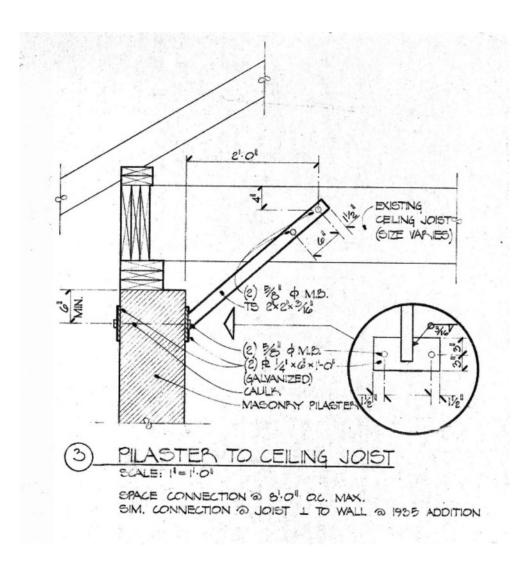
1975 retrofit detail for anchoring of BMU wall
